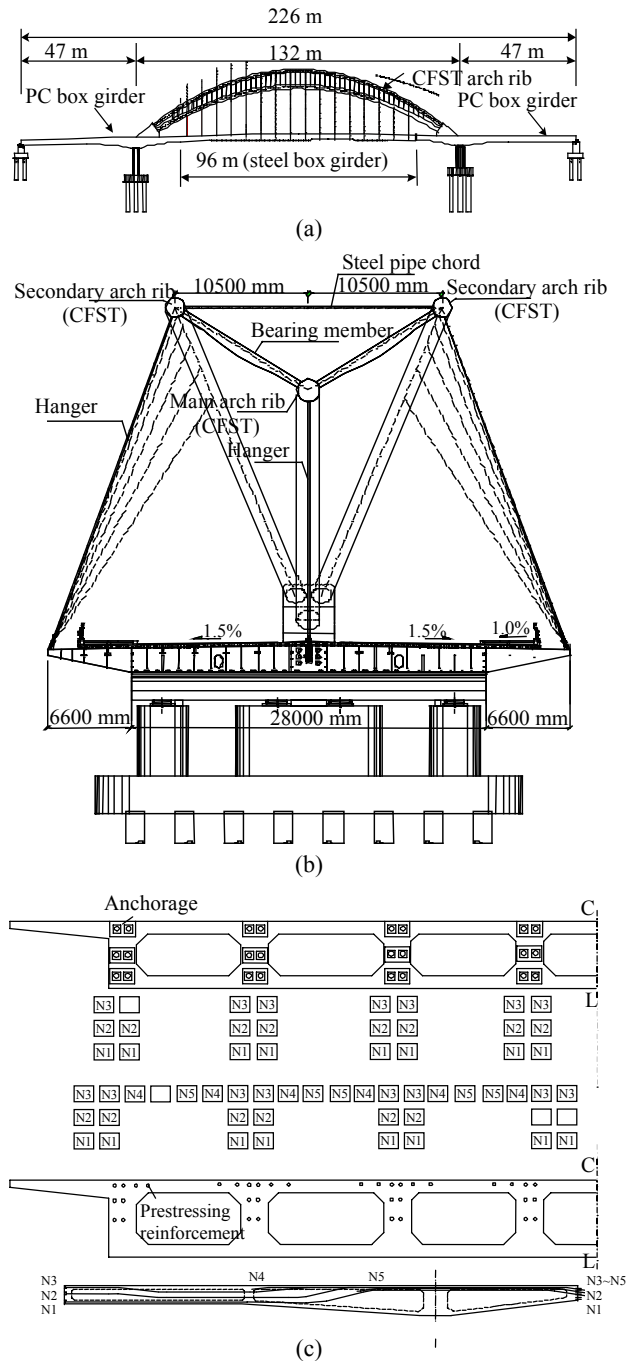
The design scheme of Fenghuajiang Bridge in Ningbo, China. (a) Elevation view; (b) The section of the mid span; (c) The section of the side span
